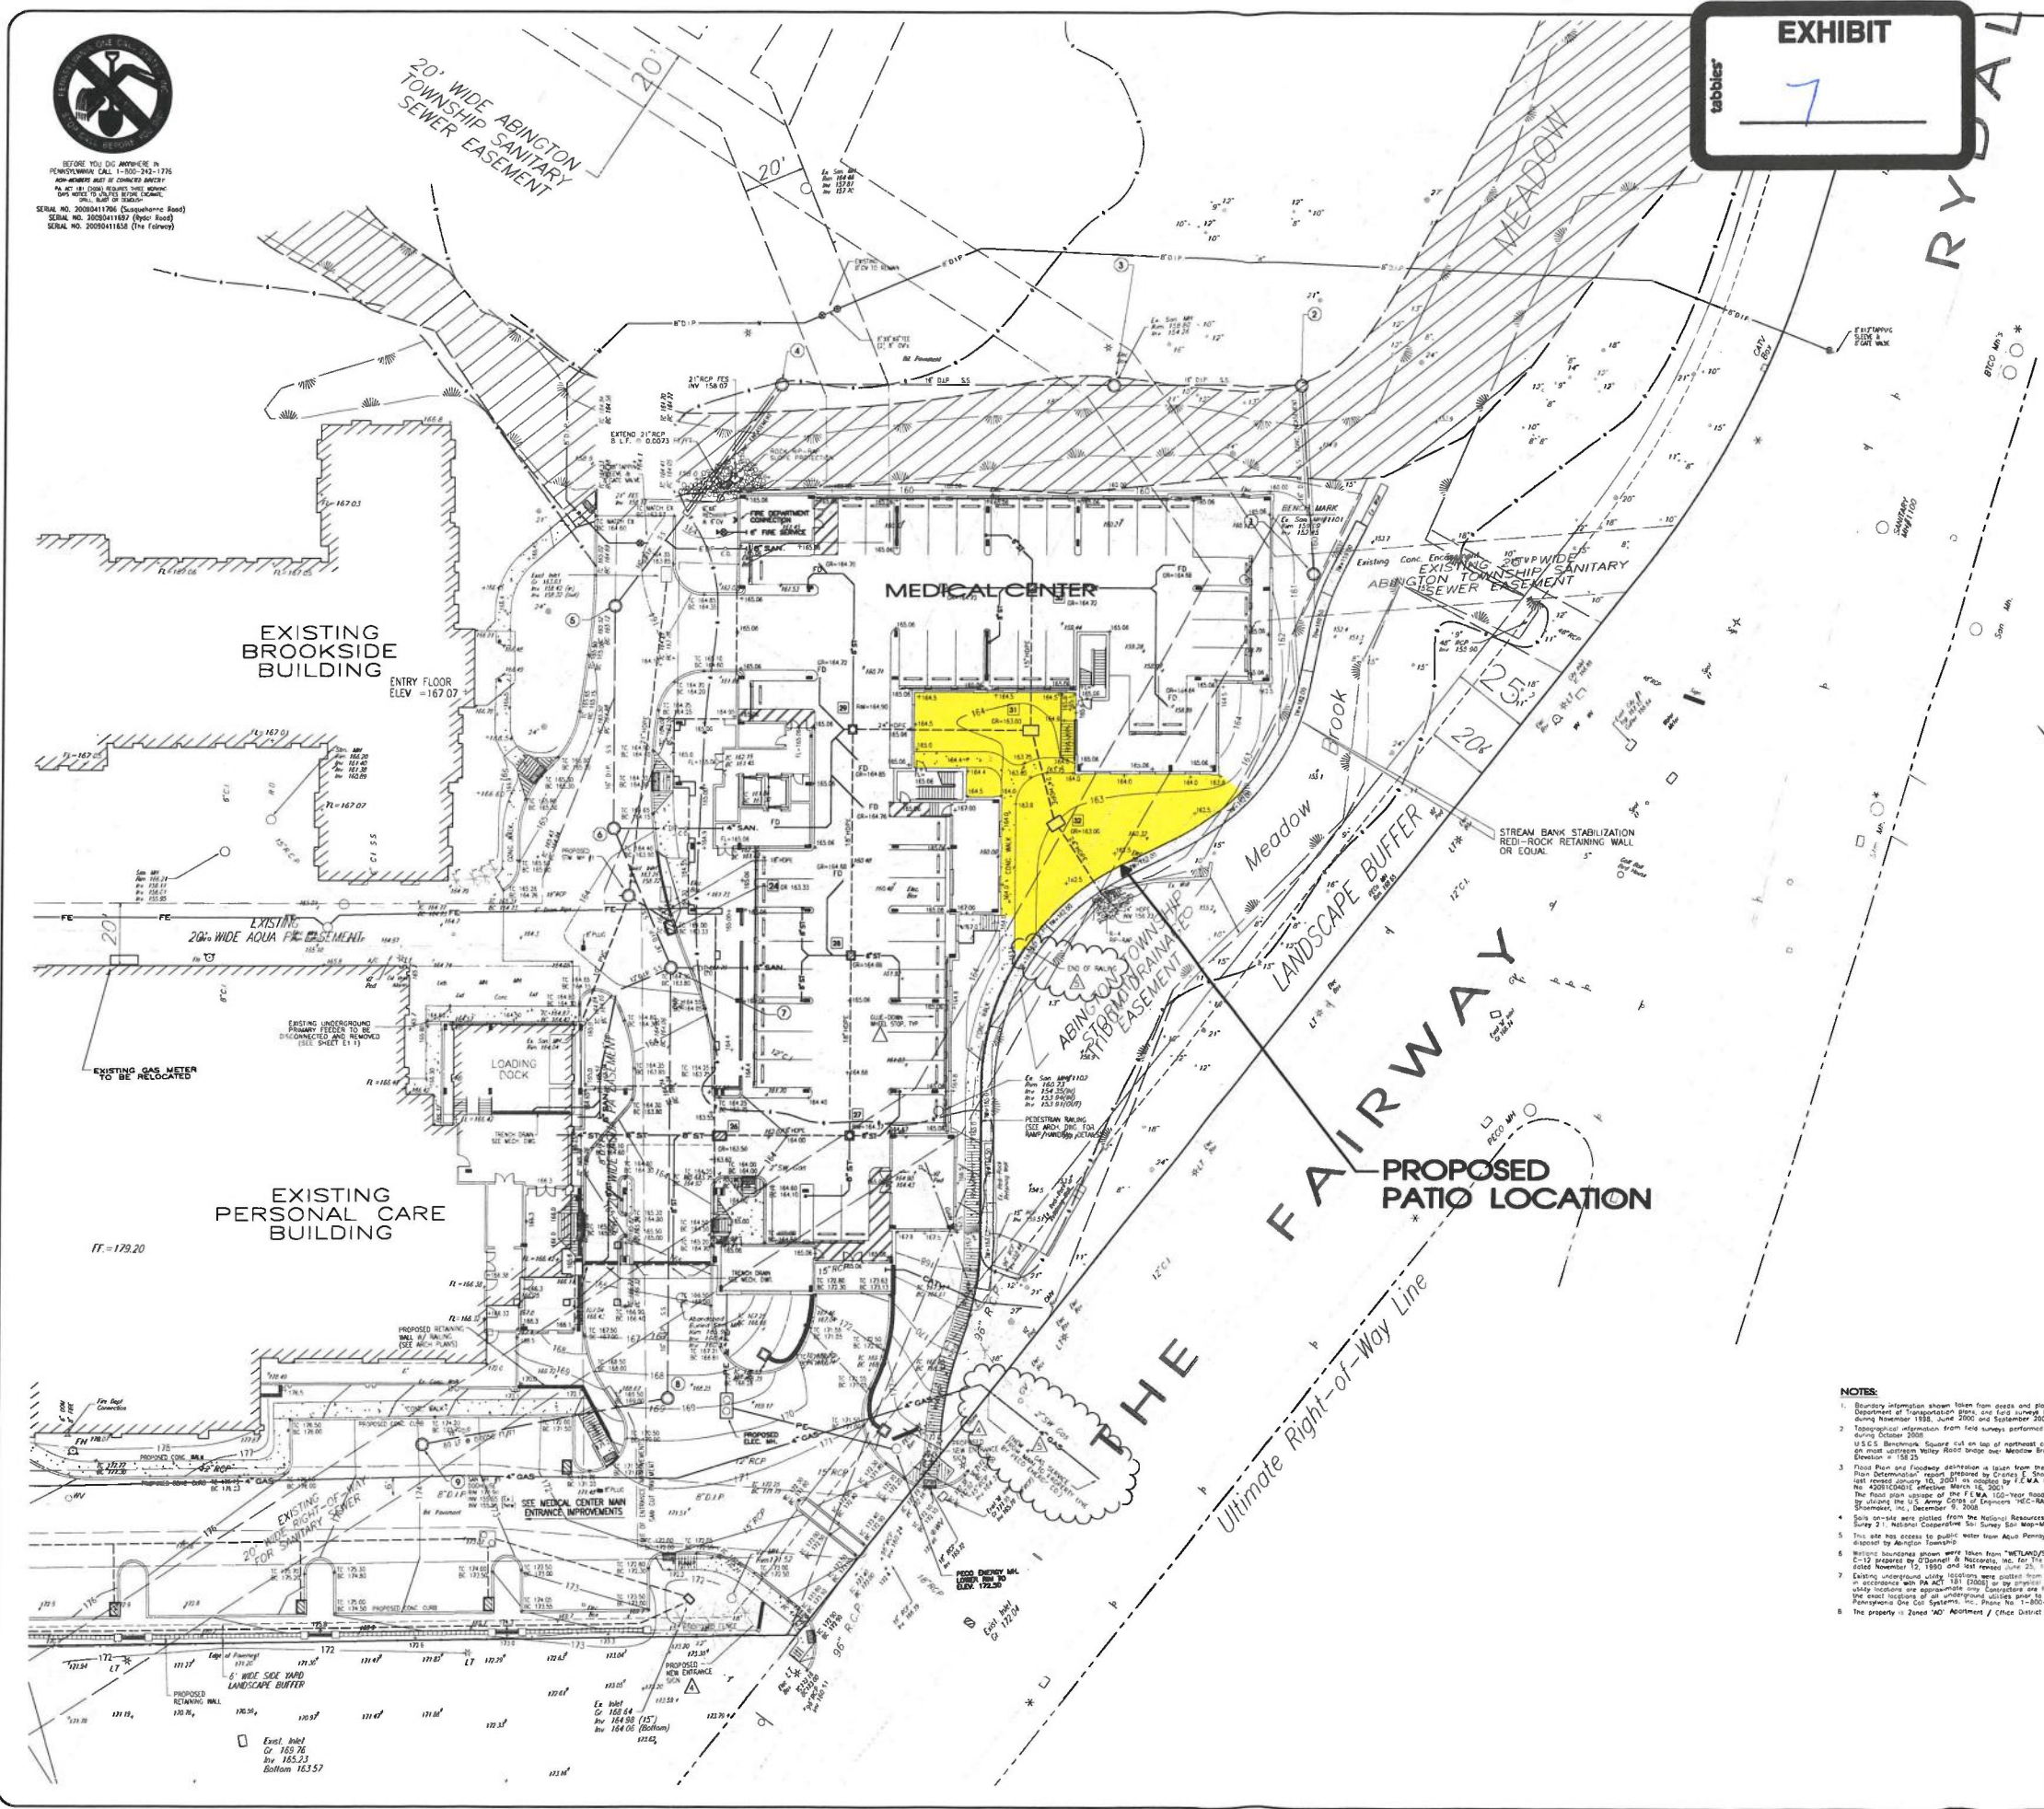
DETAIL GRADING PLAN - LOWER PARKING LEVEL
